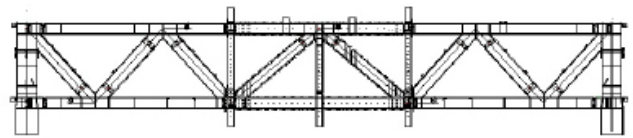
Elevation of the outrigger (Source: Fujiang Xu)
